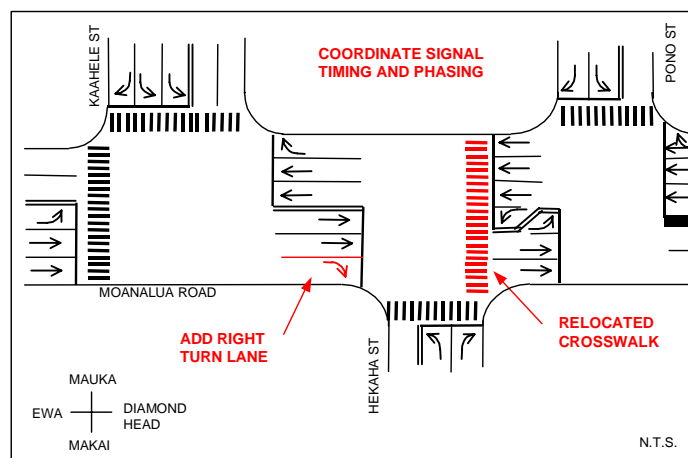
Moanalua Road at Kaahele Street, Hekaha Street and Pono Street
